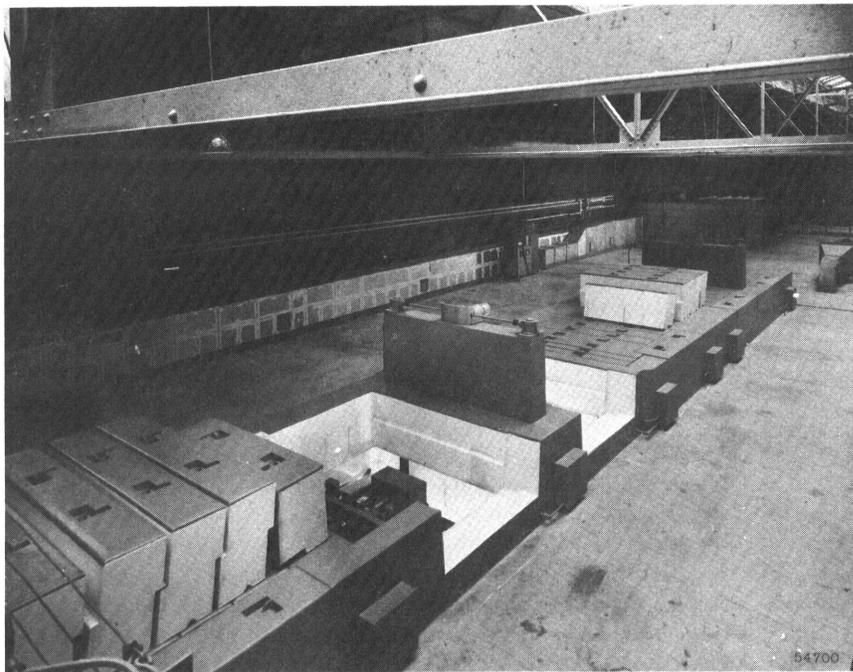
View of cell structure roof providing access into cells from top by means of removable shielding roof plug system
